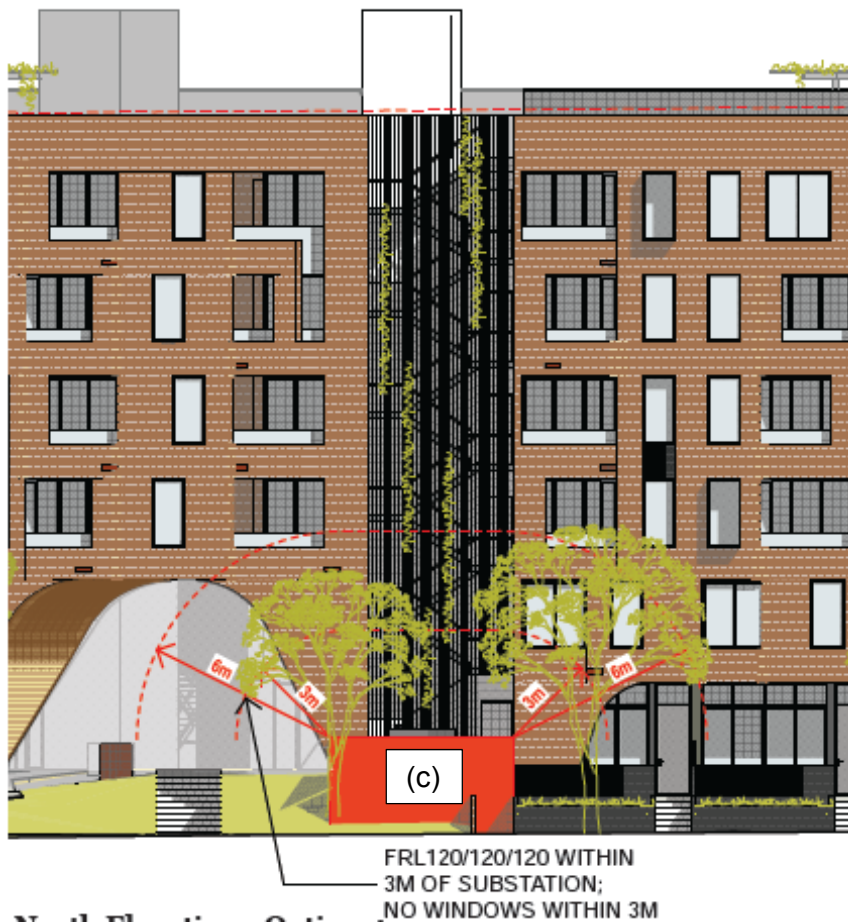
Potential blast zone of a substation chamber located to the south of Lobby C
